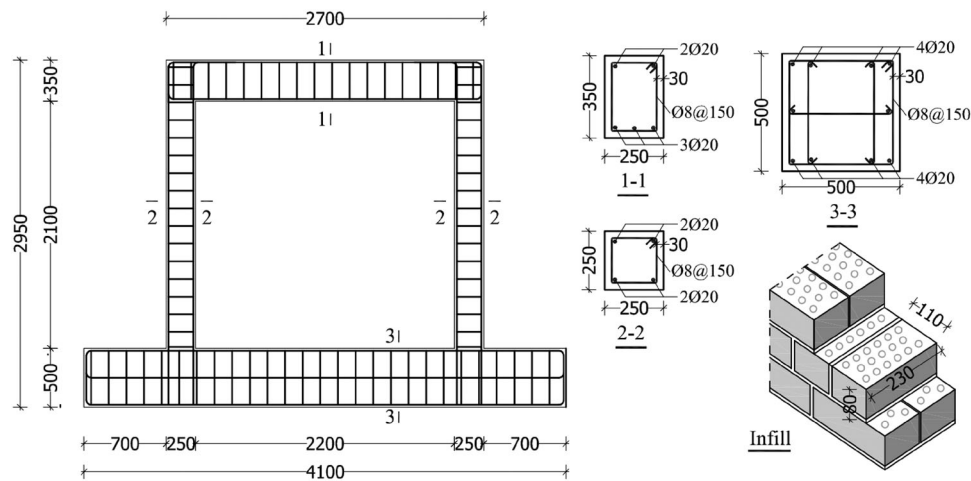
Reinforcement details of the frame and arrangement of the masonry (dimensions in mm).
